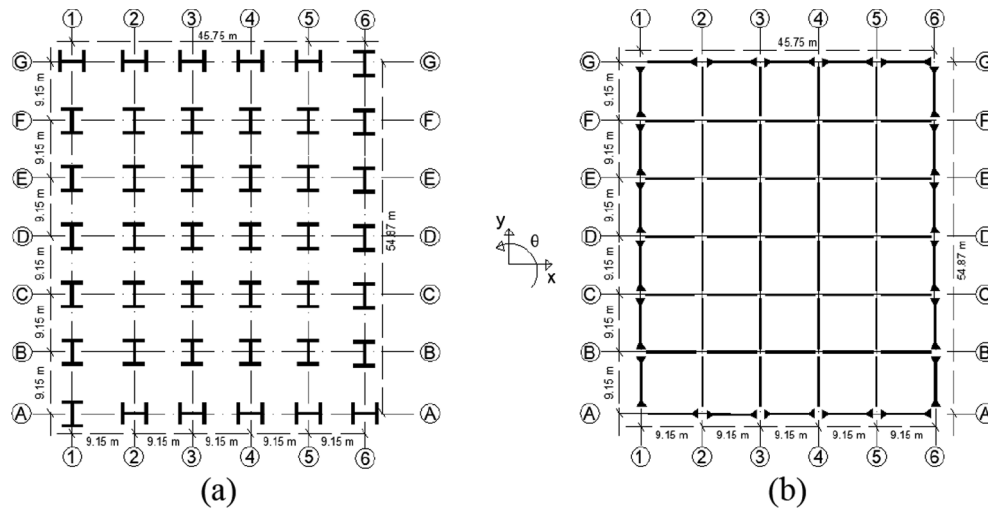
The 9-story Benchmark buildings modified it from [41]: (a) Plan view and column orientations; (b) connection types of frames.
